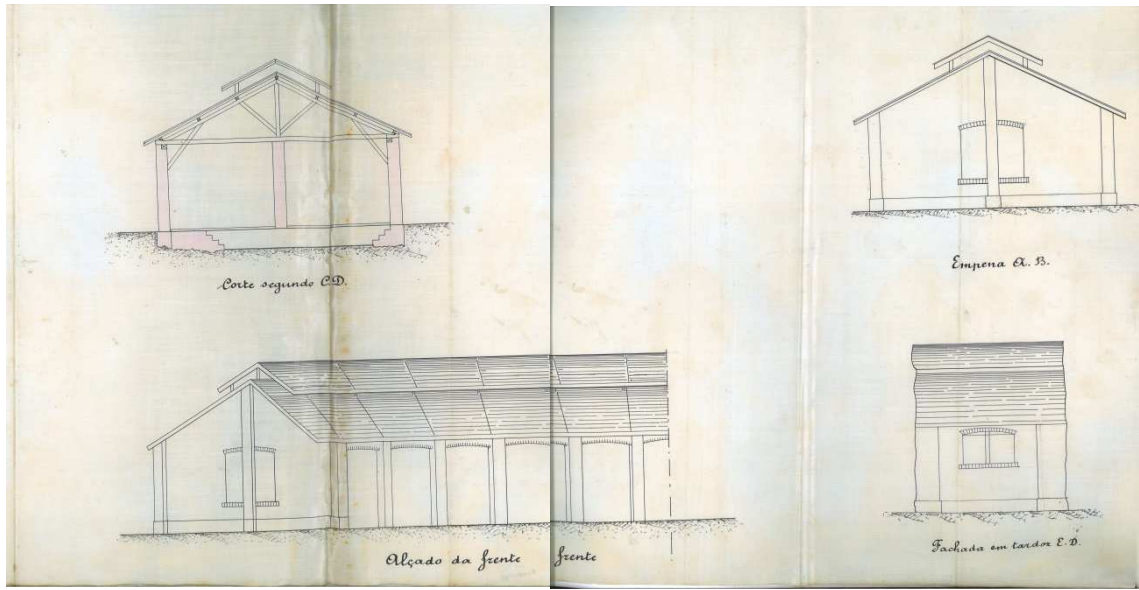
Design S. Sebastião Maritime Station: semi-roundhouse detailing, circa 1910. Clockwise from left to right: principal facade, interior with roof, side wing and window rear.
